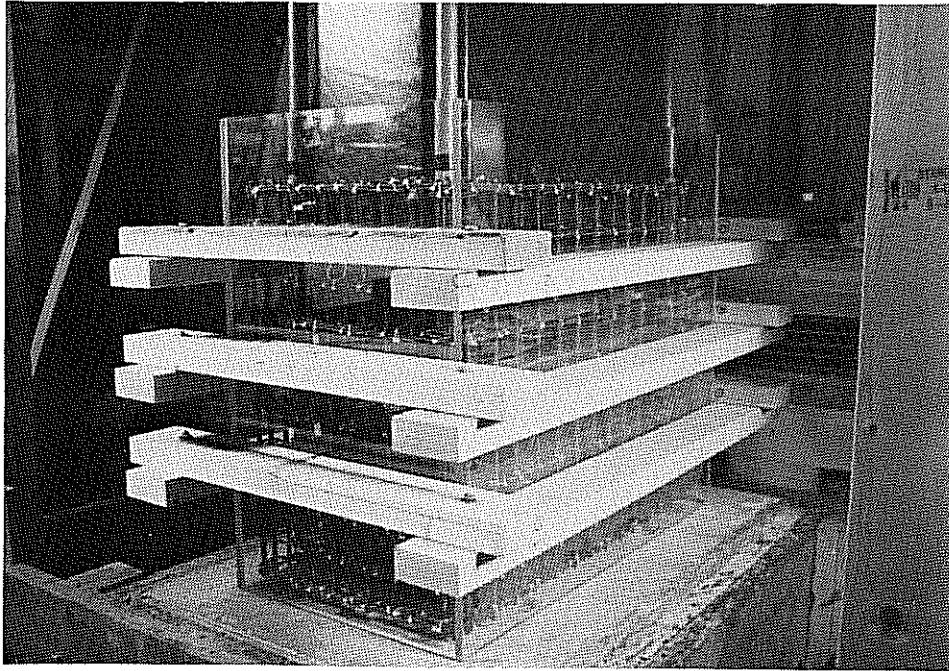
Multiple-Lift and Segmental Specimen Formwork
